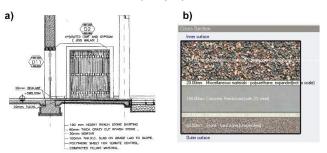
Ground floor layer: a) as built detail, b) design builder data entry ground layer.
